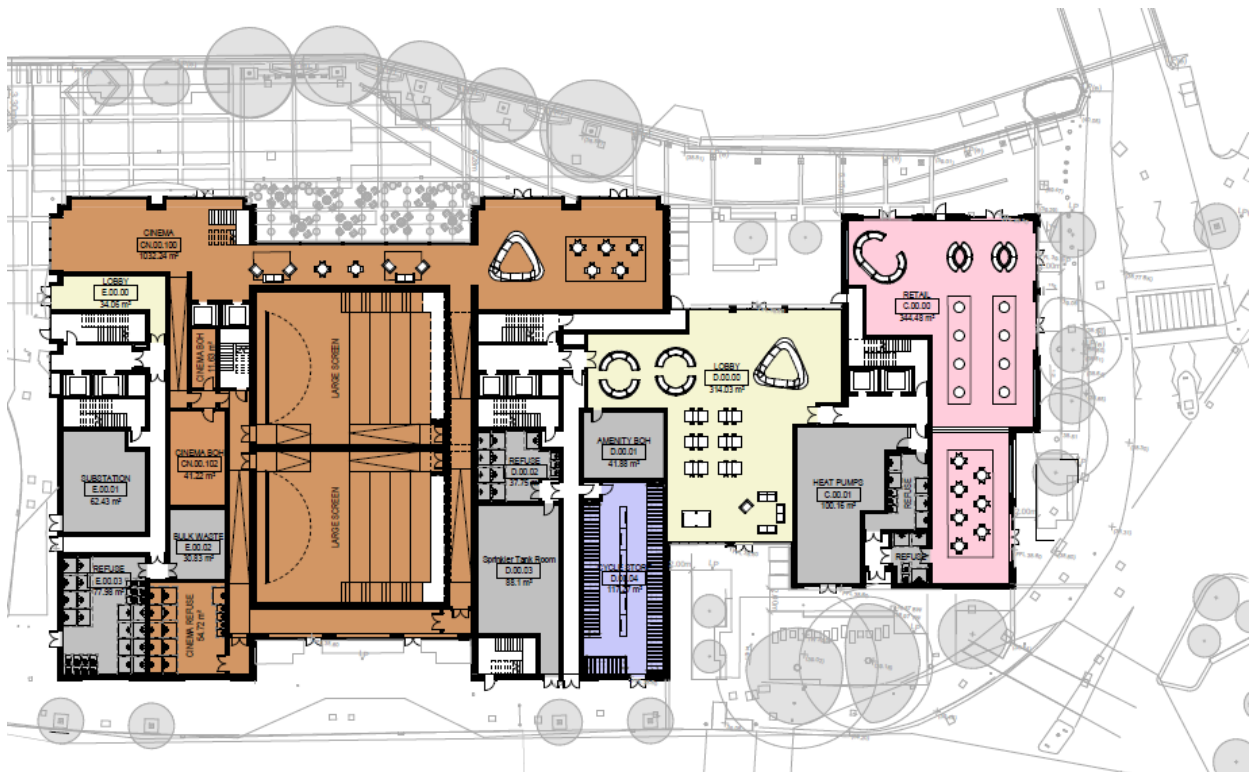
YHP2 – Proposed Ground Floor Plan. Proposed cinema shown shaded orange/brown, proposed retail/restaurant/bar floorspace show shaded pink, back of house and plant rooms shown shaded grey, cycle stores shaded purple and new residential lobby and access shown shaded yellow
